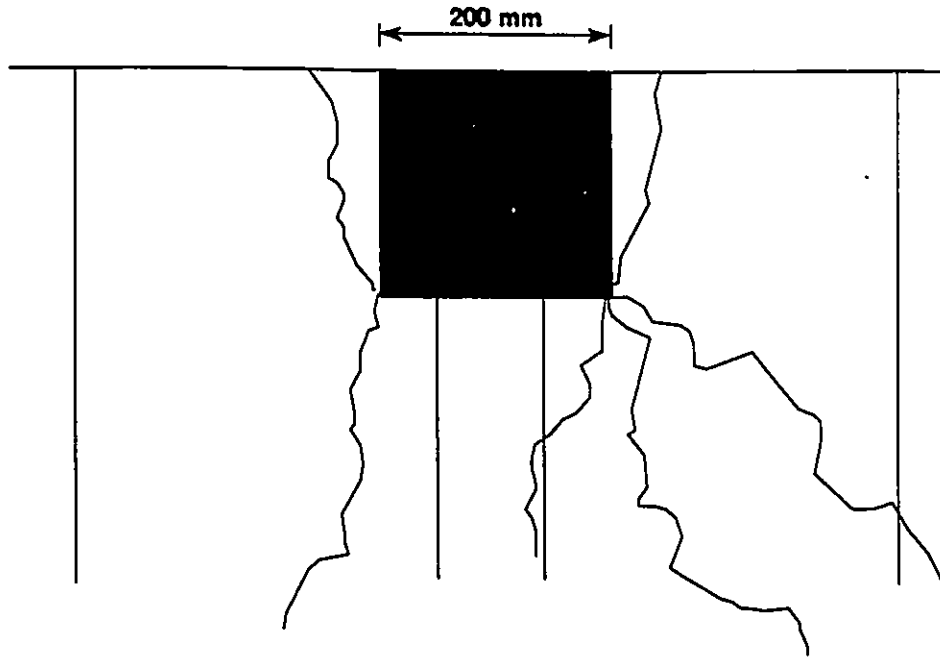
Crack pattern around north-edge column immediately before the failure in south-edge column
